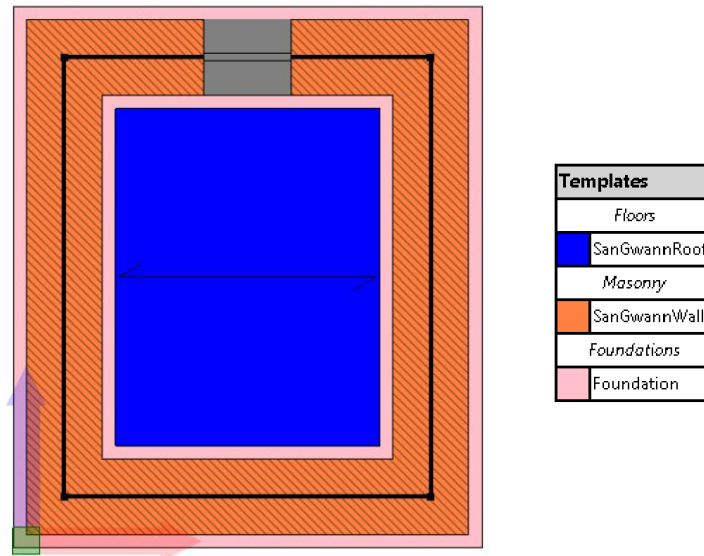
3D Macro Plan from 0 – 5780mm Layout of St. Philip & St. James Chapel in San Gwann.
